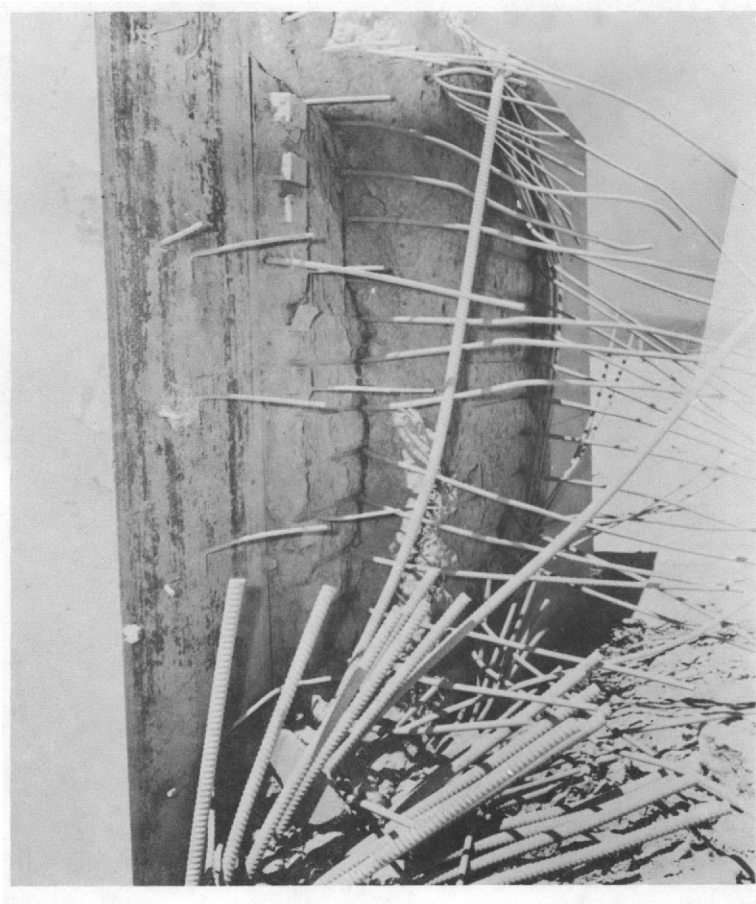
Postshot, north face close-up showing separation of concrete along planes of reinforcement.
